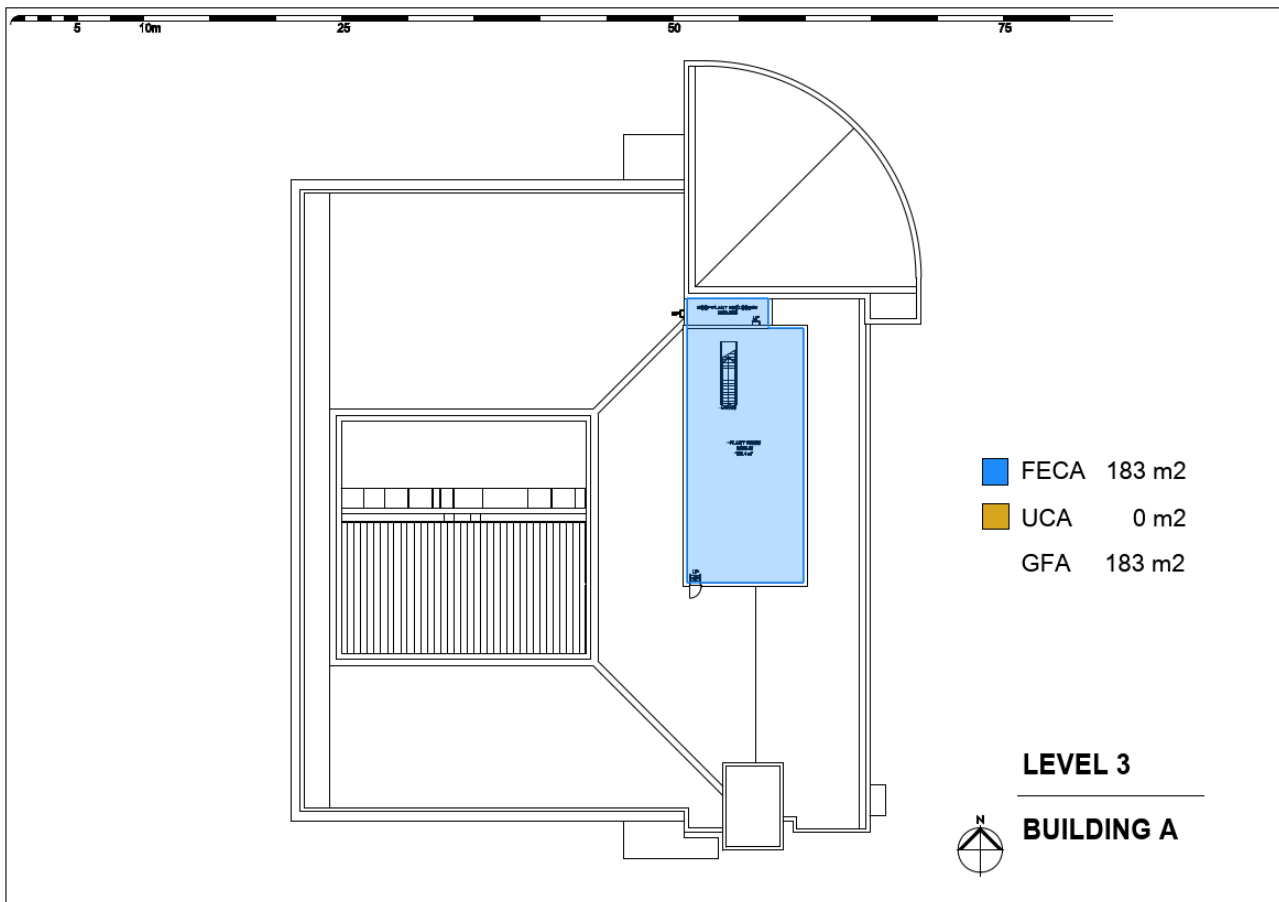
Building A – GFA – Level 3 (Roof Level)
